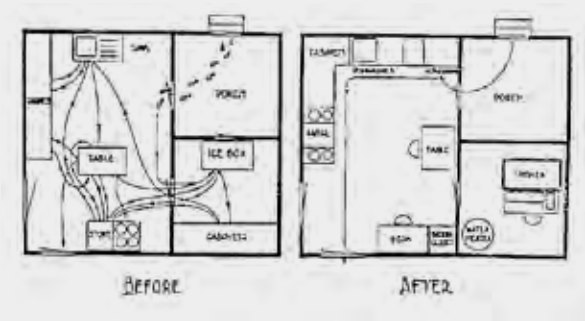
1936 floor plans show before-and-after kitchen renovations. The new plan includes a continuous kitchen.
